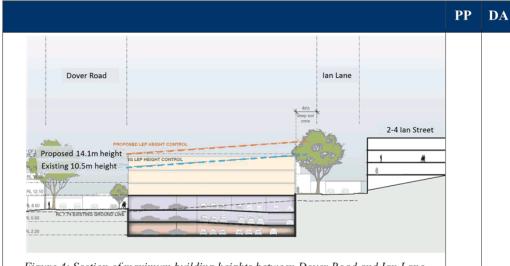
Section of maximum building heights between Dover Road and Ian Lane
